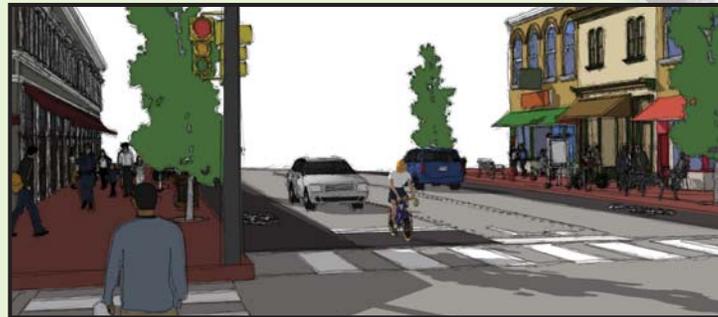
Crossings, sidewalks, bike lanes, and streets downtown
